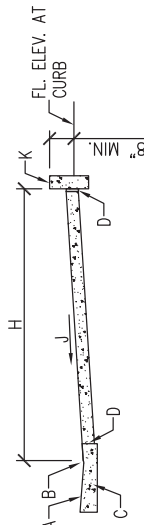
DETAIL B ADEQUATE R.O.W. FOR SETBACK SIDEWALK ADJACENT TO PERPENDICULAR RAMP
